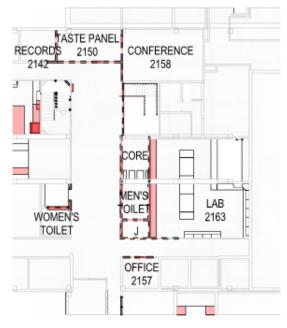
Phasing Diagram Demo Floor Plan, Level 2
